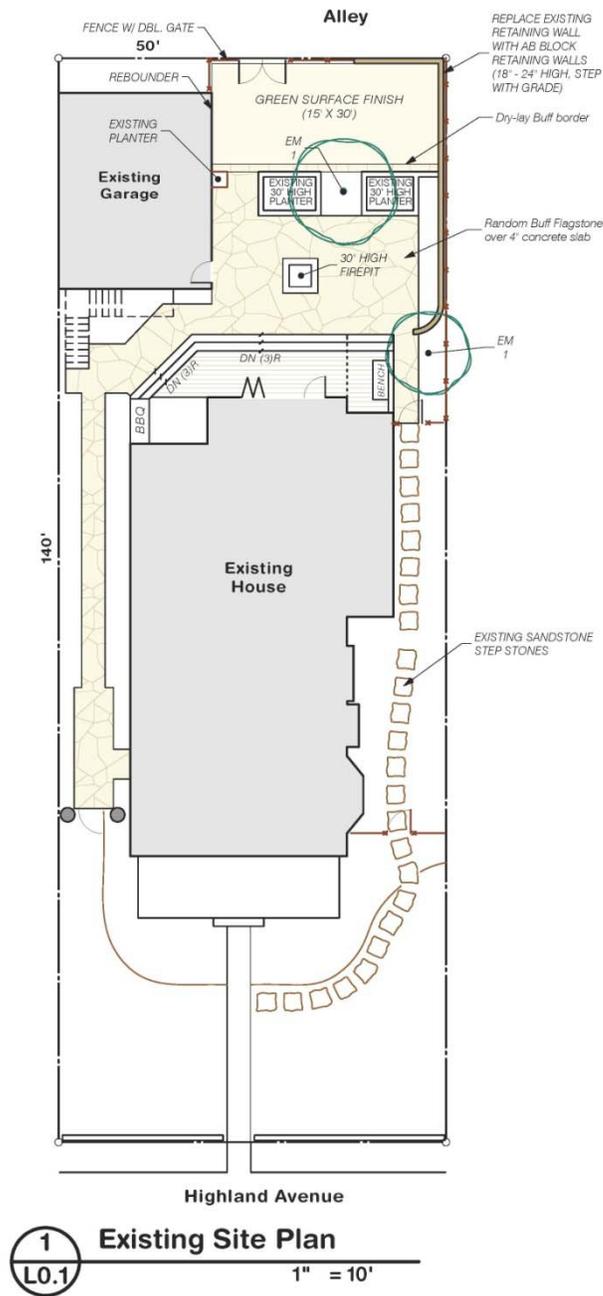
437 Highland Ave., Landscape Plan, Current (2014).
